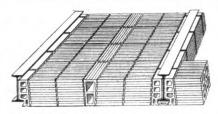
Combination of end and side construction, the type of flat hollow tile arch most used to-day.
